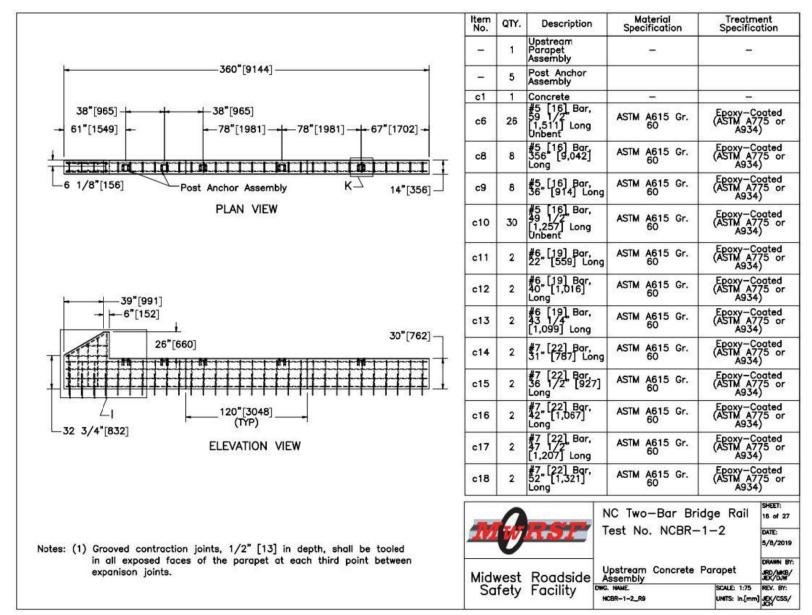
Upstream Concrete Parapet Assembly, Test Nos. NCBR-1 and NCBR-2
